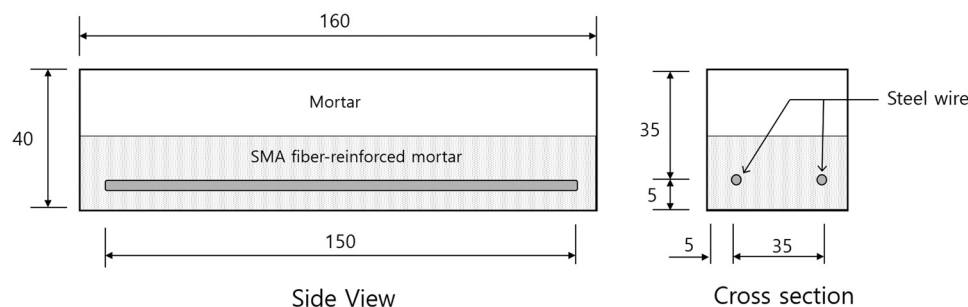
Geometry and cross section of a beam specimen (units: mm).
